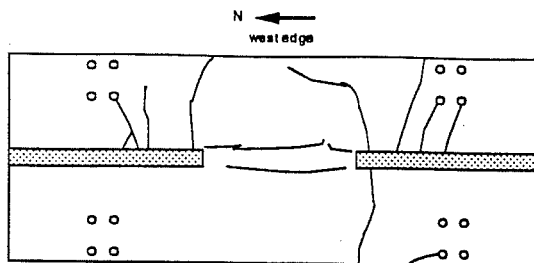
Sp. 2b: Progression of Cracking of Bottom Face of Roof Slab at End of Test
